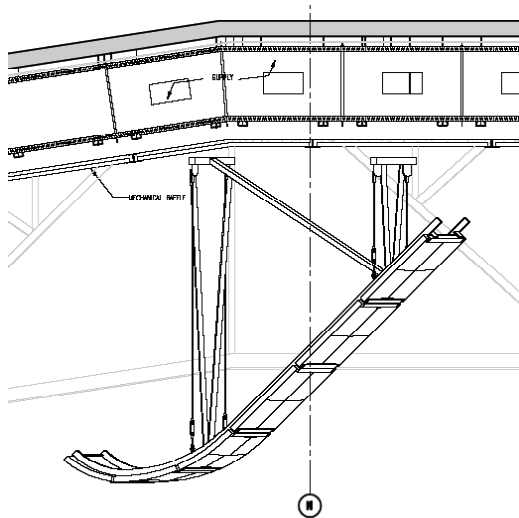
Detail of one of the lateral reflectors in the ceiling truss space. Above the reflector is the ventilation system's Supply Air plenum.
